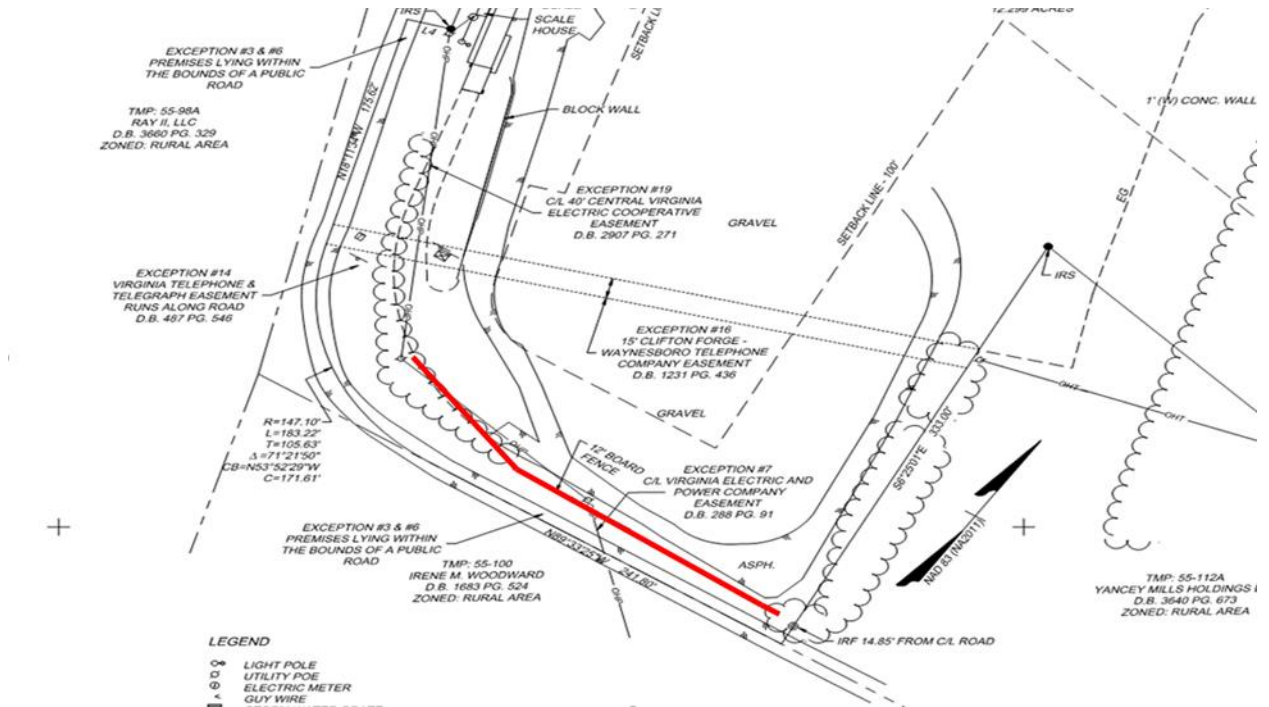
Exhibit C: Exhibit Showing Wall between Sorter and Stacker
